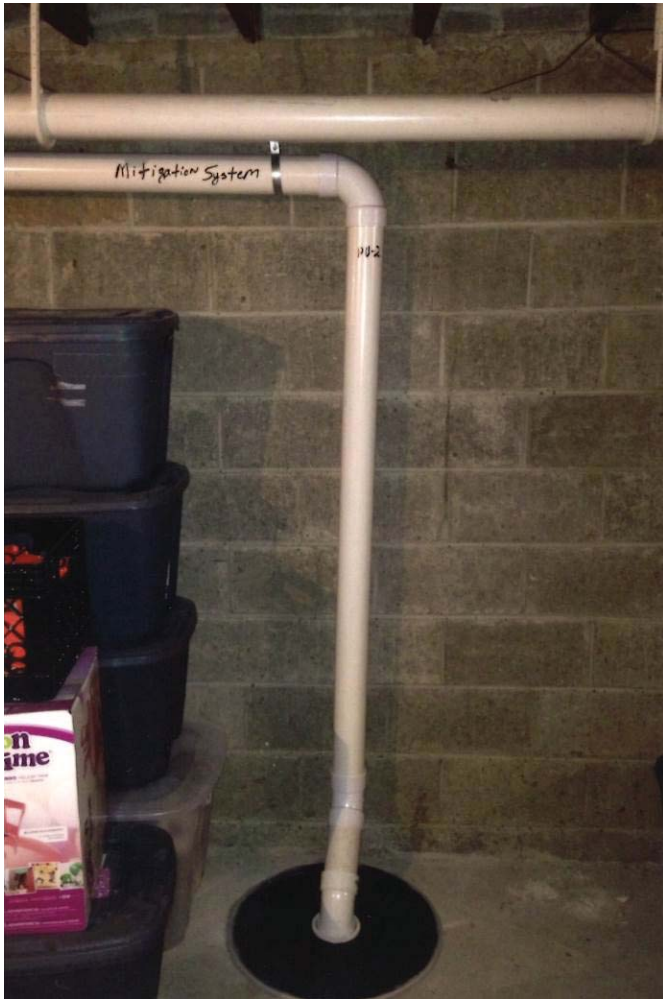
View looking west at mitigation system Pickup Point #2 (PU-2) in basement of 2803-2807 University Avenue.
